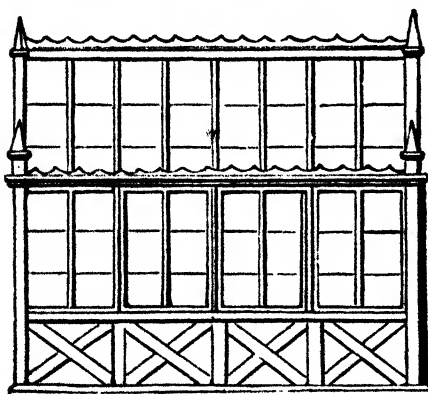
GREENHOUSE (FRONT ELEVATION).
